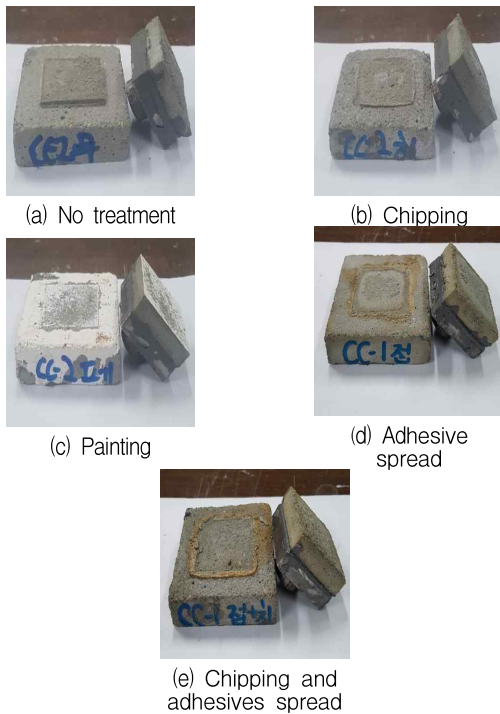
Typical images after the adhesive failure at the existing concrete surface
